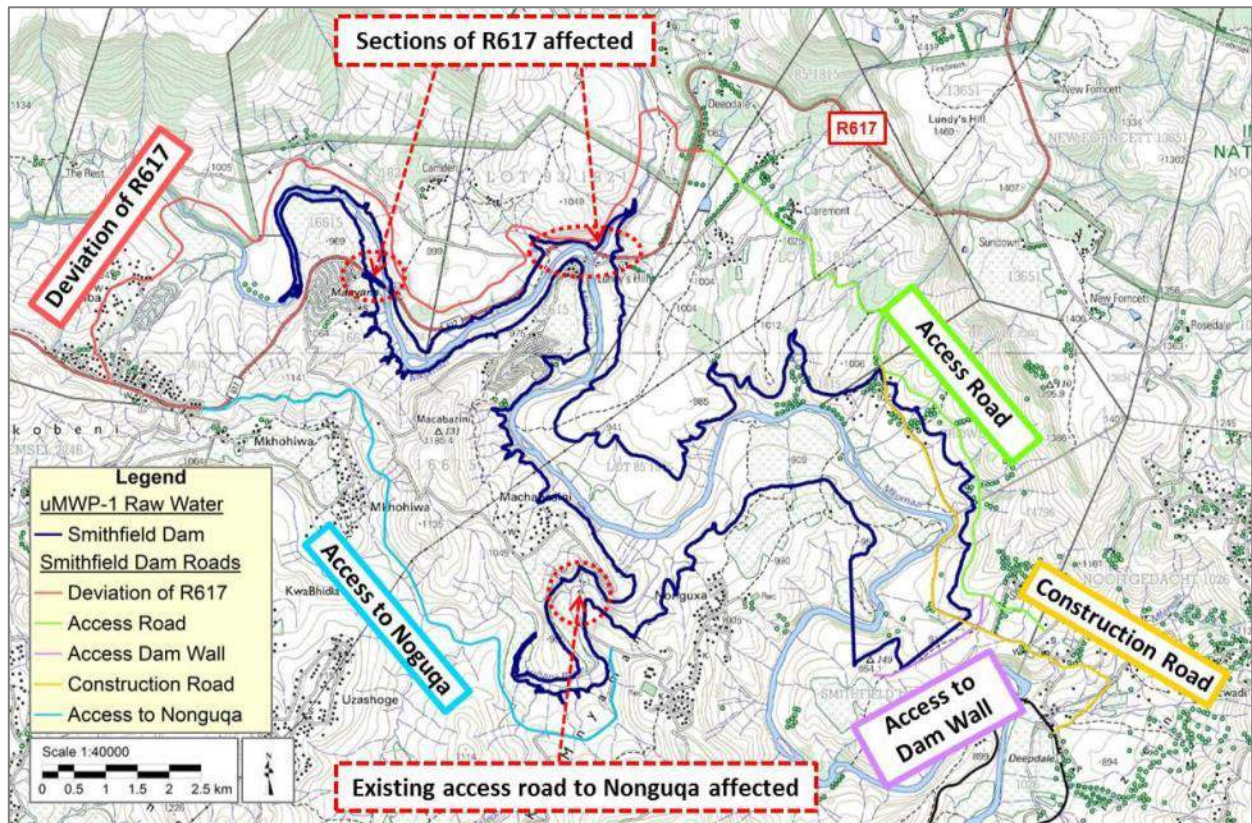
Road Layout at Smithfield Dam - Revised Alternatives
